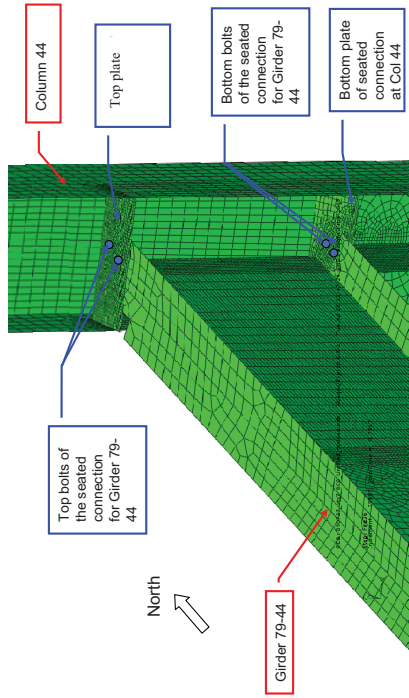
Isometric view of detailed girder and connection at column 44 (Connectors representing bolts are shown by the blue dots)
